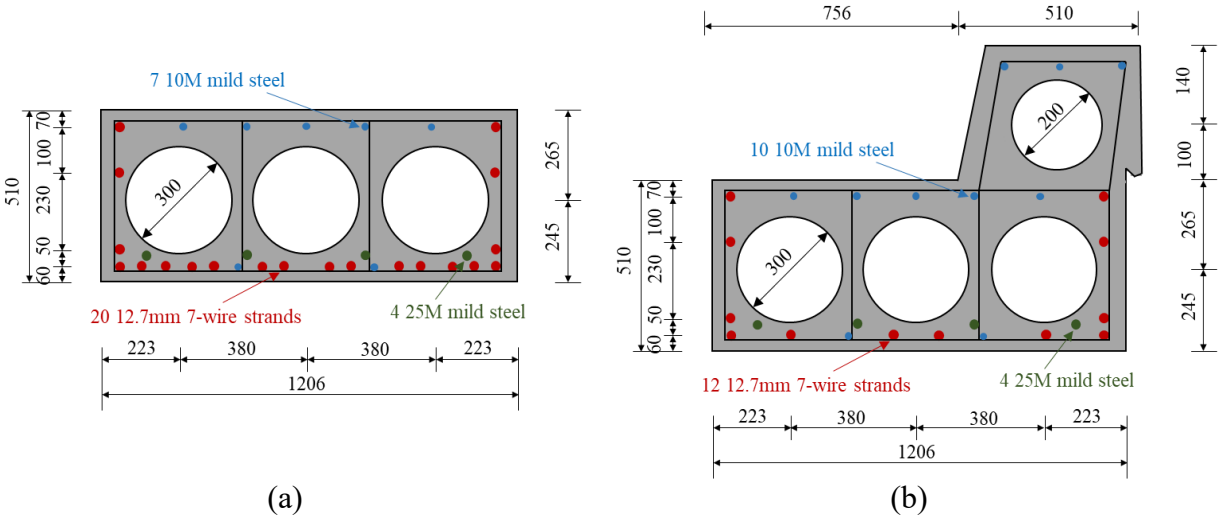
Cross sections of SM-510: (a) interior girders, and (b) exterior girders (dimension in mm)
